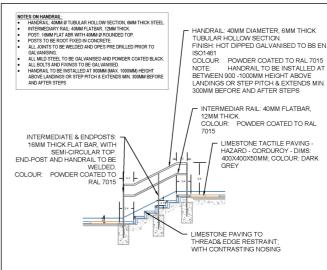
GUARDRAIL WITH TOP MOUNTED HANDRAIL TO RIVERSIDE PATHWAY (MATCH WITH EXISTING STYLE OF RAILING)
